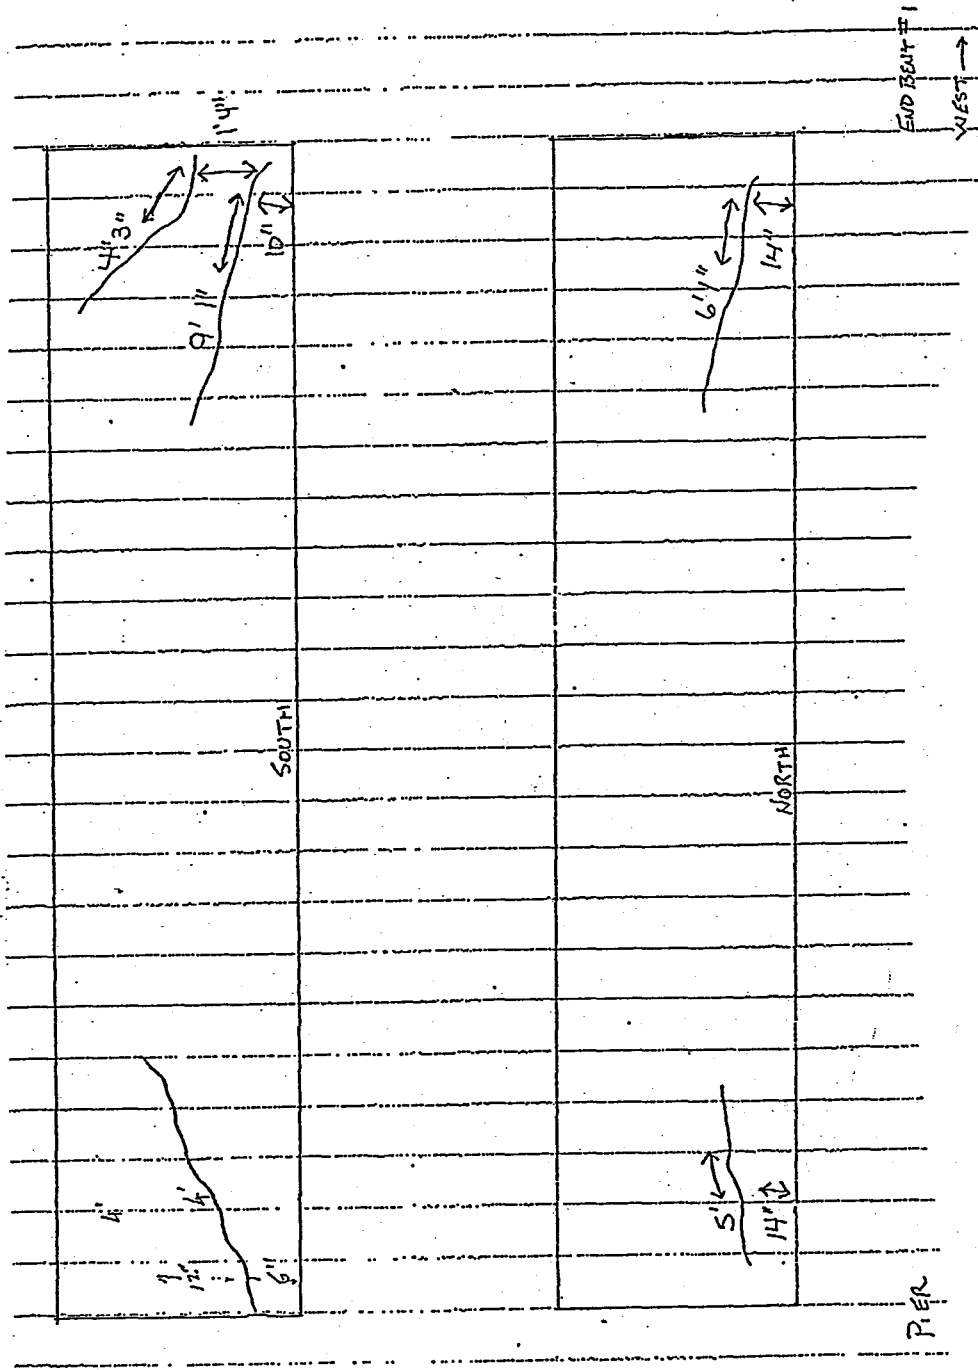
Crack of South Exterior Girder over I-75 SB
